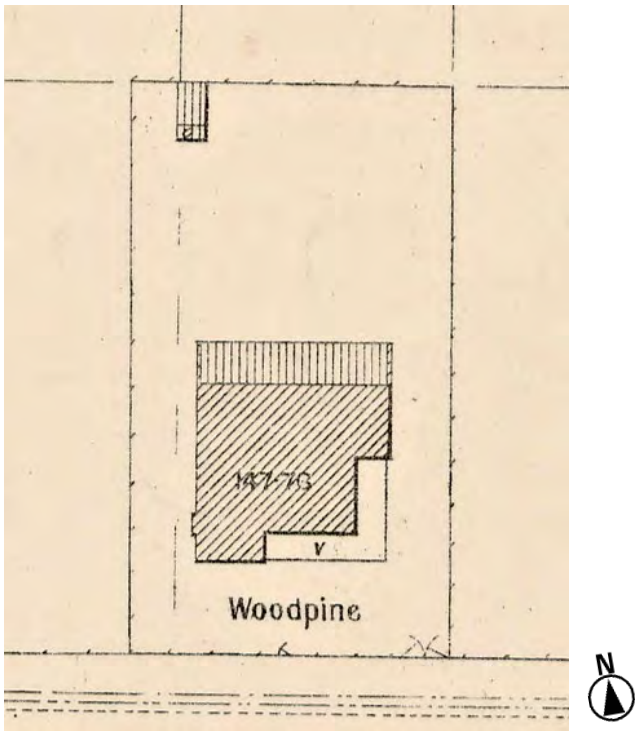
MMBW Detail Plan No 2562 showing a footprint of the house at 18 Adelaide Street, 1918. Diagonal hatching indicates a brick or stone structure, straight hatching indicates a timber structure (Source: SLV)
